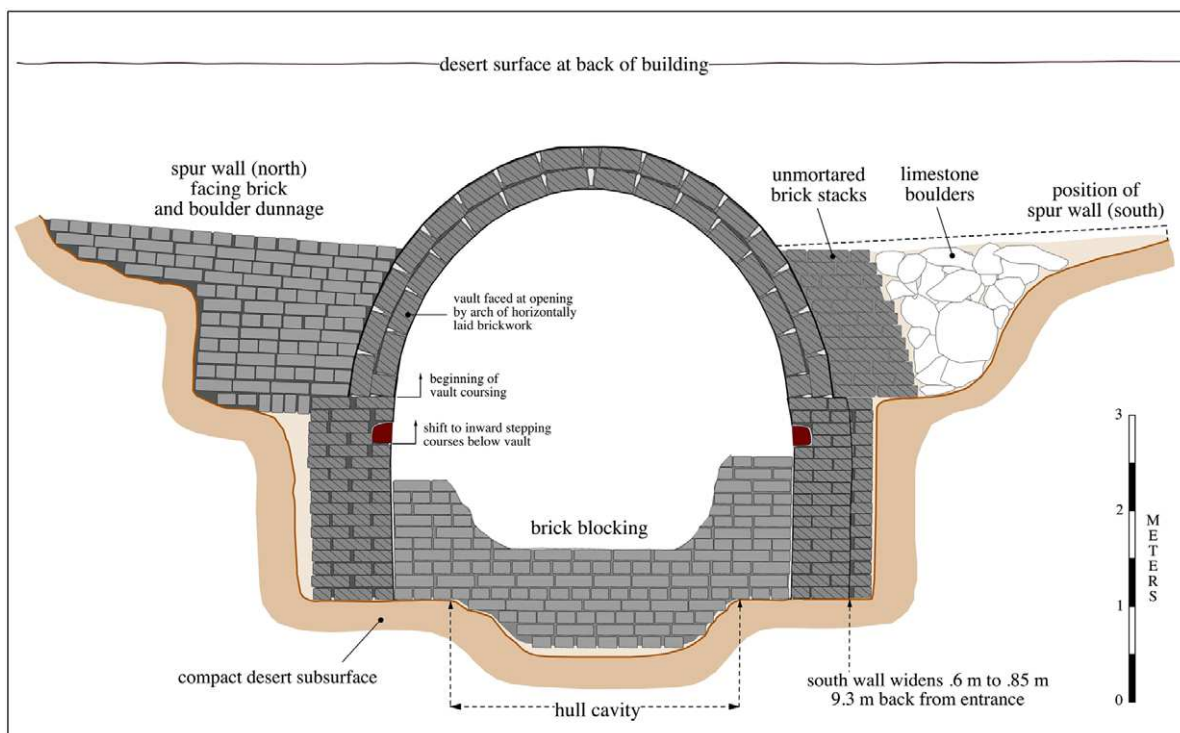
Cross section of the front of the boat building (view looking east) showing the relationships of the major structural elements. (J. Wegner)
